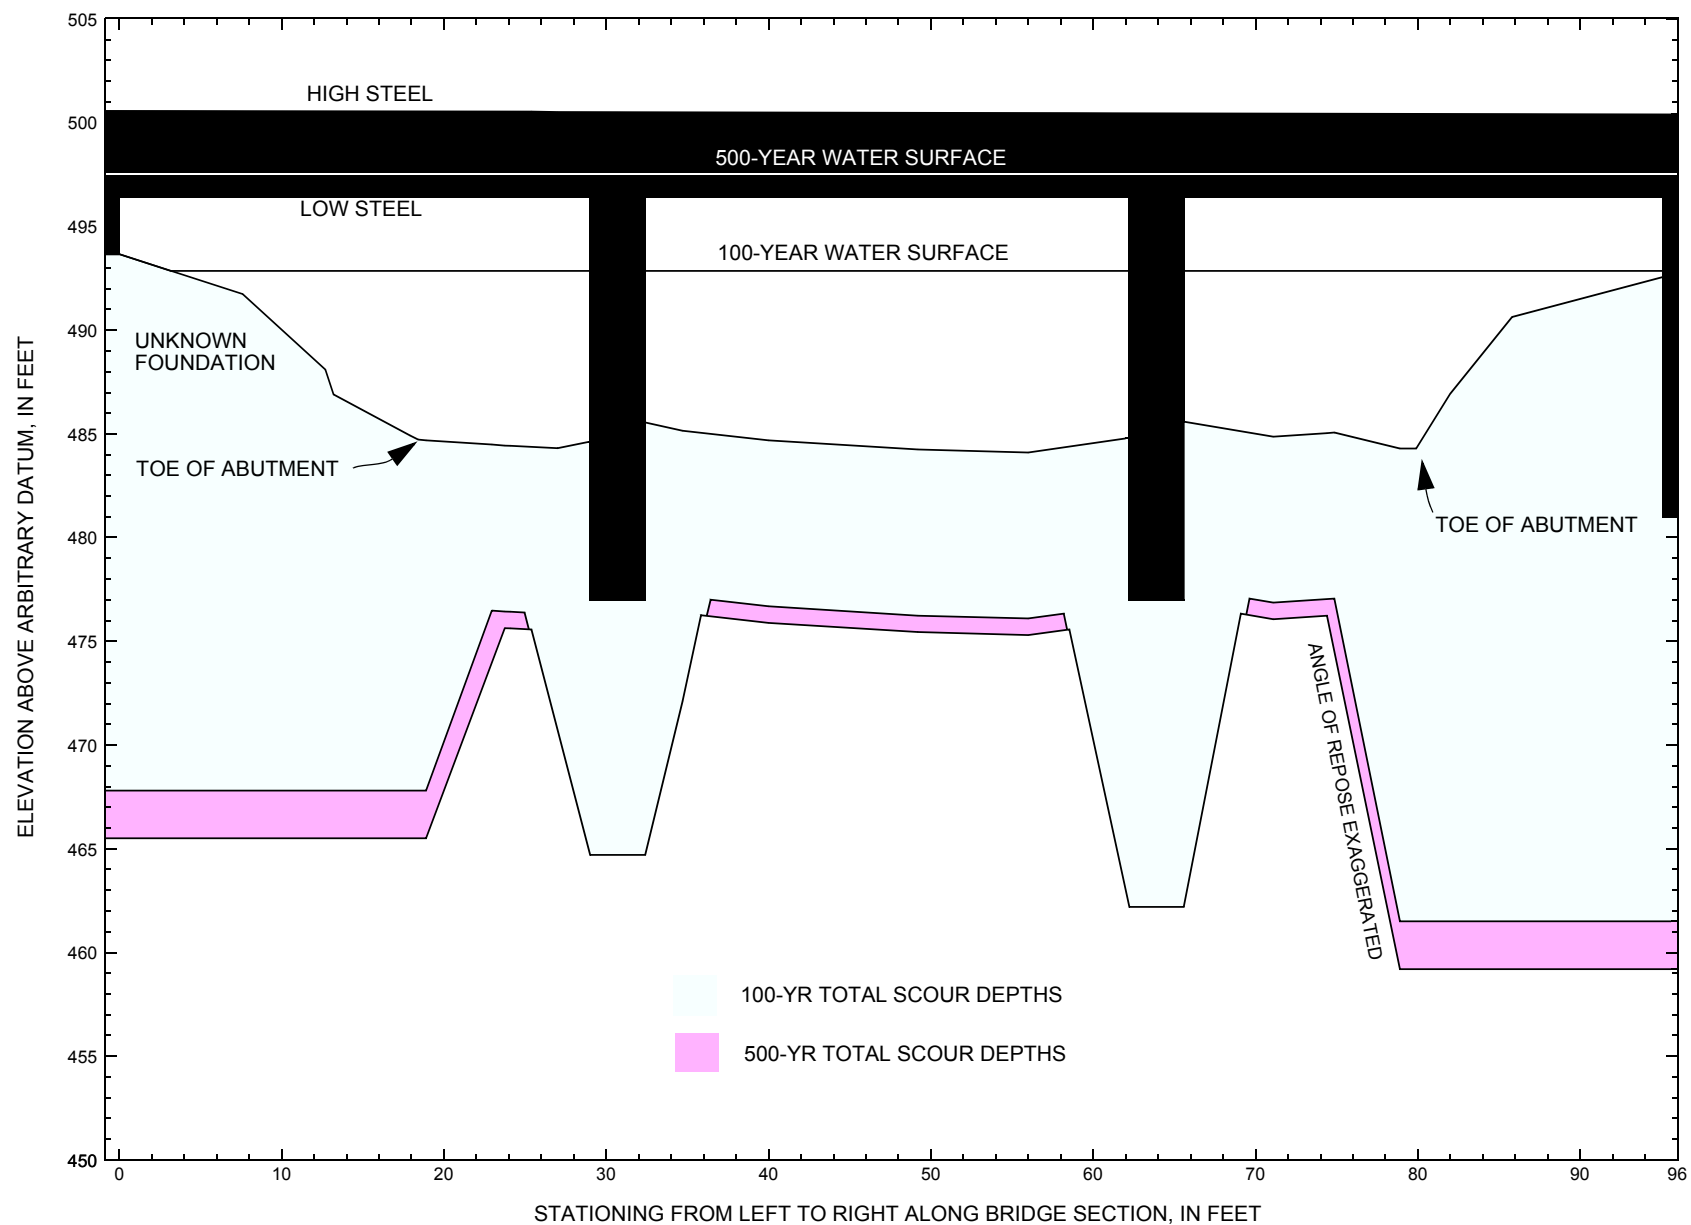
Scour elevations for the 100-yr and 500-yr discharges at structure CANATH00010001 on town highway 1, crossing Halls Stream, Canaan, Vermont.
